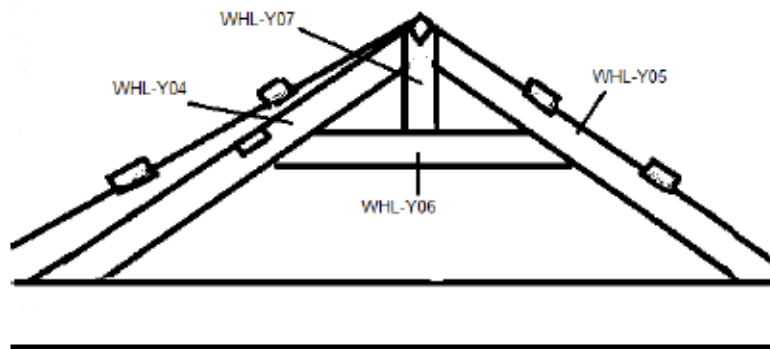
Sketch of truss 2, showing the location of samples WHL-Y04–07
